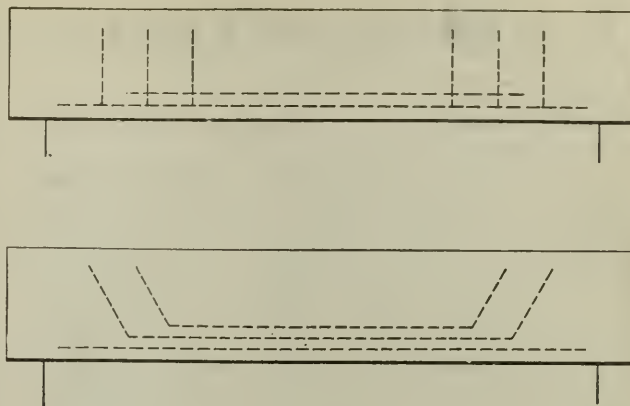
STANDARD REINFORCED-CONCRETE BEAMS
